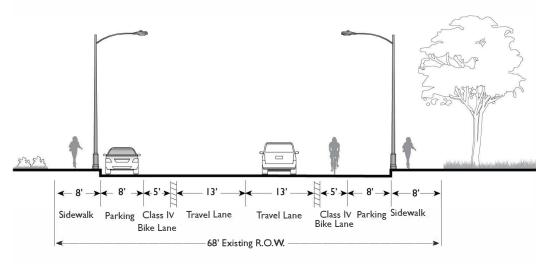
EAST AIRWAY BOULEVARD BETWEEN ISABEL AVENUE AND STREET A (LOOKING NORTHEAST)
